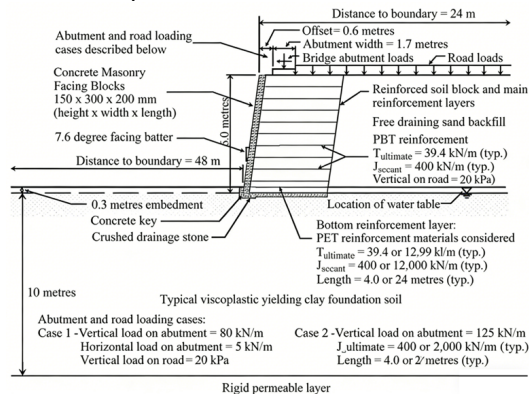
Cross-section of GRS-RW under surcharge load of bridge abutment and traffic [38]
